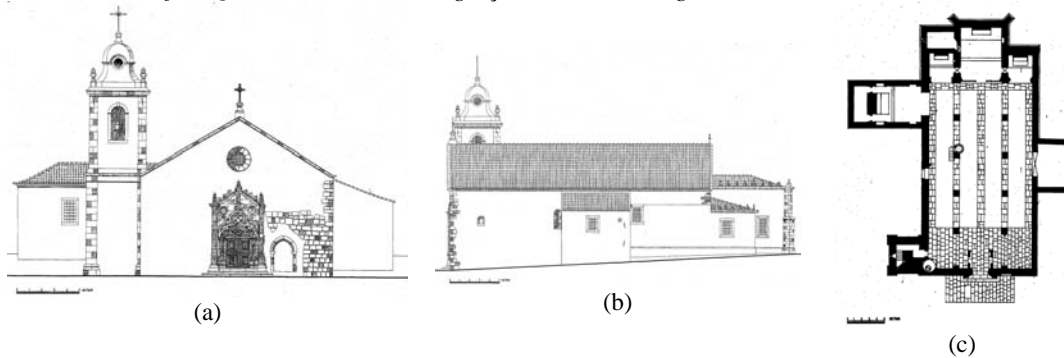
Geometry: (a) main façade; (b) lateral façade; (c) plan.
